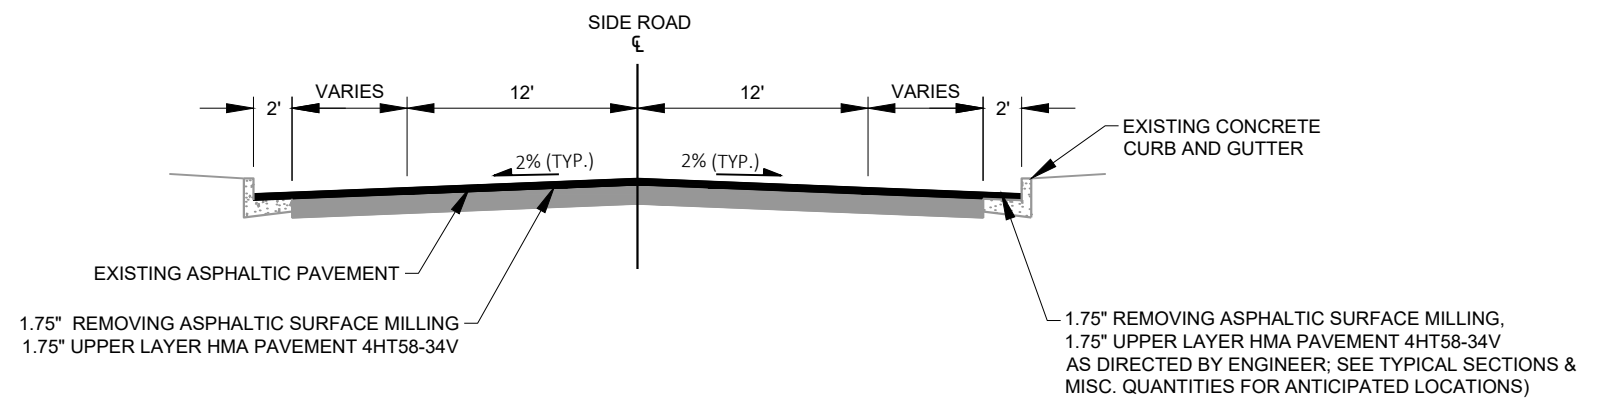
DETAIL OF PAVED SIDE ROAD - URBAN (NO MAINLINE GRADE RAISE)
